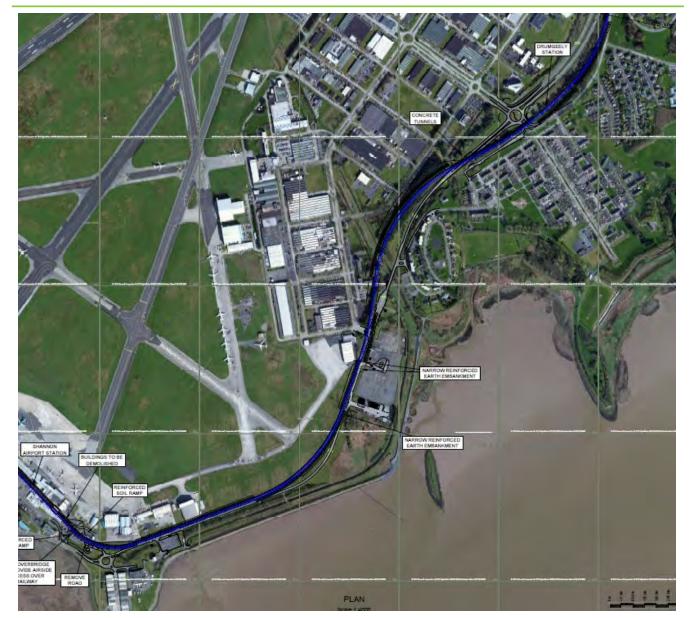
County Development Plan – Proposed Rail Corridor (from CAD file provided by CCC)
